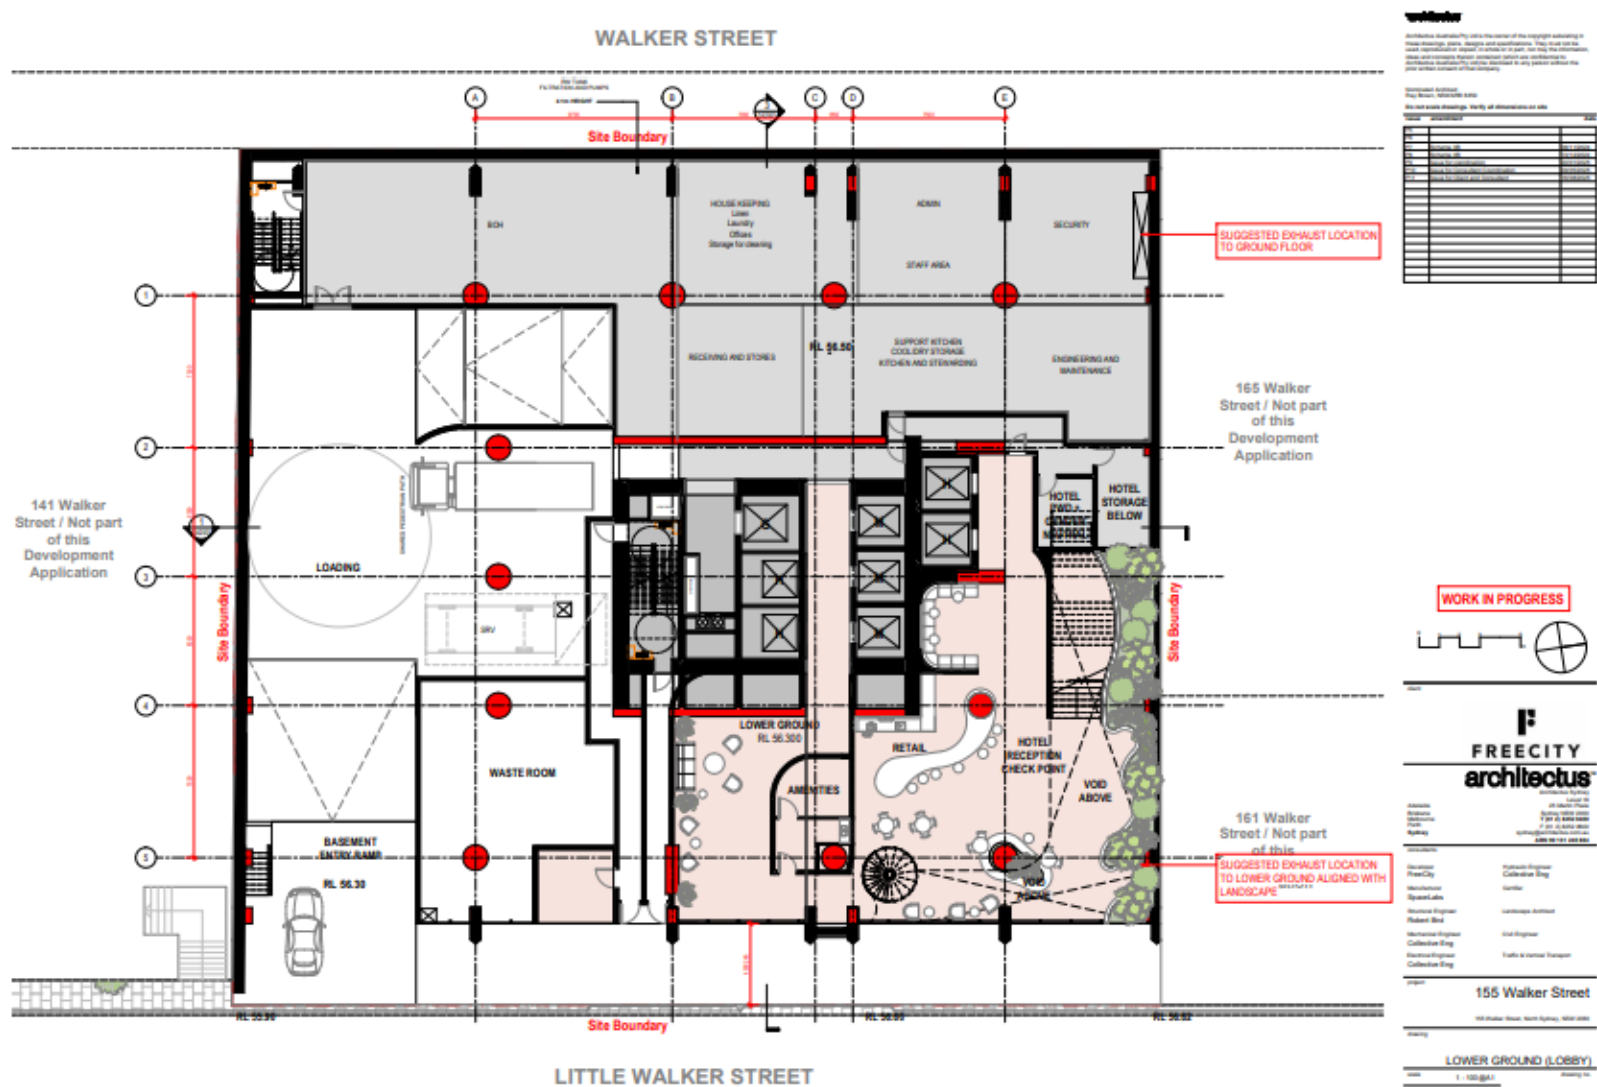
Extract of proposed plans showing Lower Ground (Lobby)
